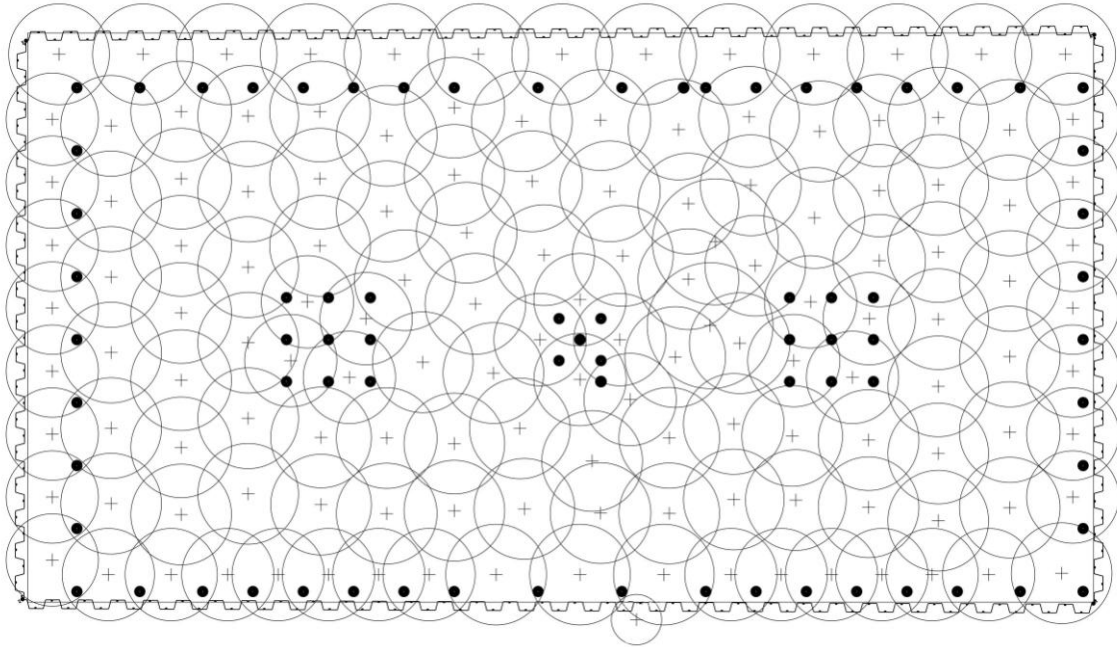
Plan view of cement-bentonite slurry wall surrounded by sheetpiles, with jet grouted base seal
